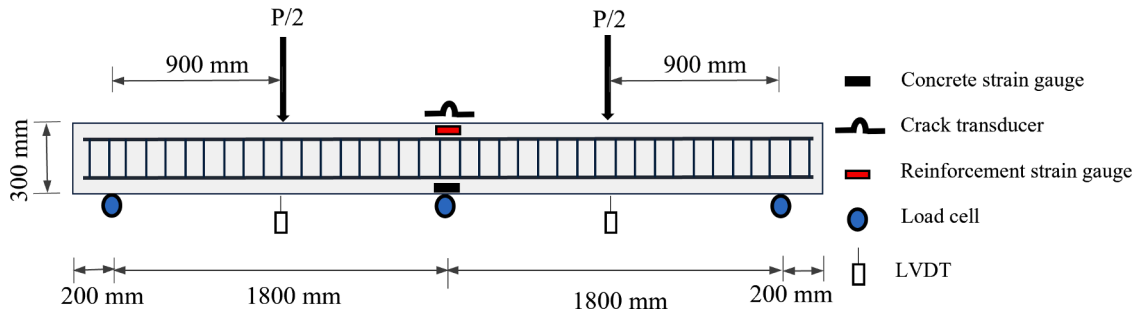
Test setup and instrumentations of a typical beam specimen.
